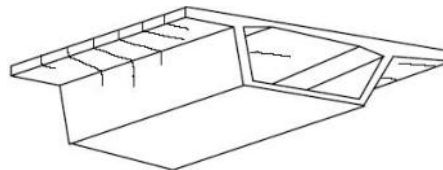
Box Girder Cracks Induced by Flexure (Negative Moment)
